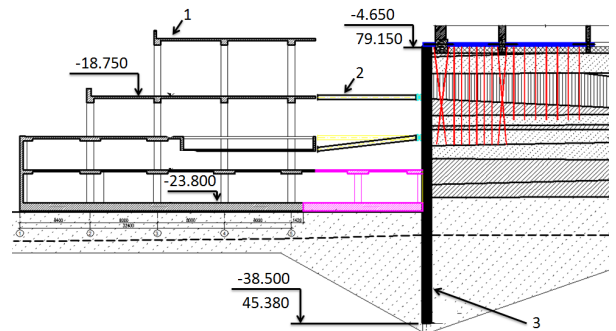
Dismantling the strut system and concreting the remaining part of the monolithic frame: 1 – new part of the building; 2 – a strut system; 3 – wall in the ground.
